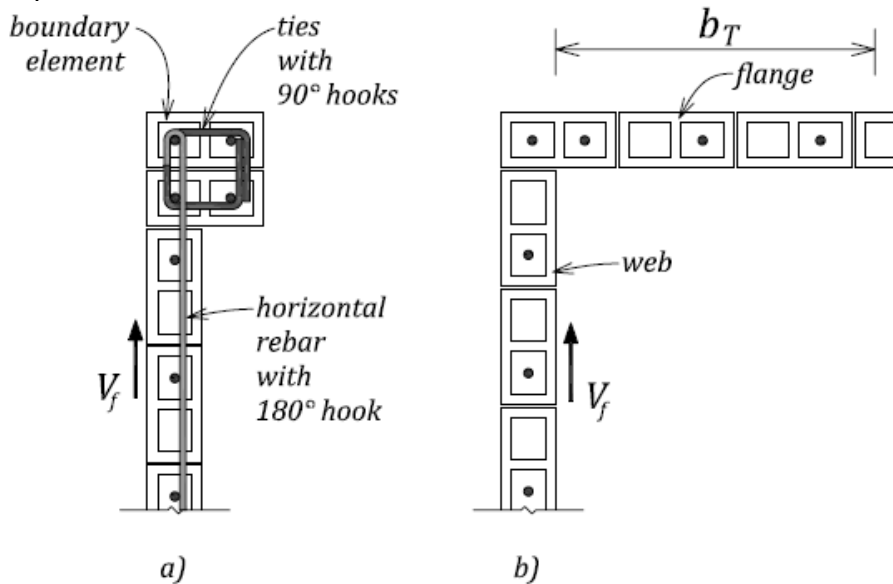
Boundary elements and flanges in reinforced masonry shear walls: a) boundary elements; b) flanged shear walls.
